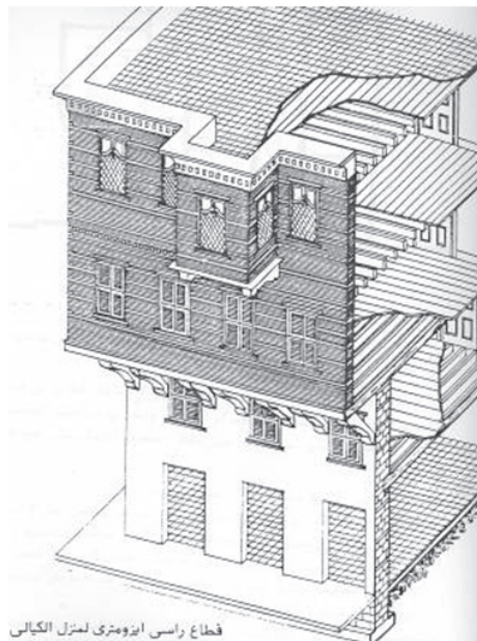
Three dimensional section of the Kayali house illustrating the building materials and structural system<sup>19</sup>
